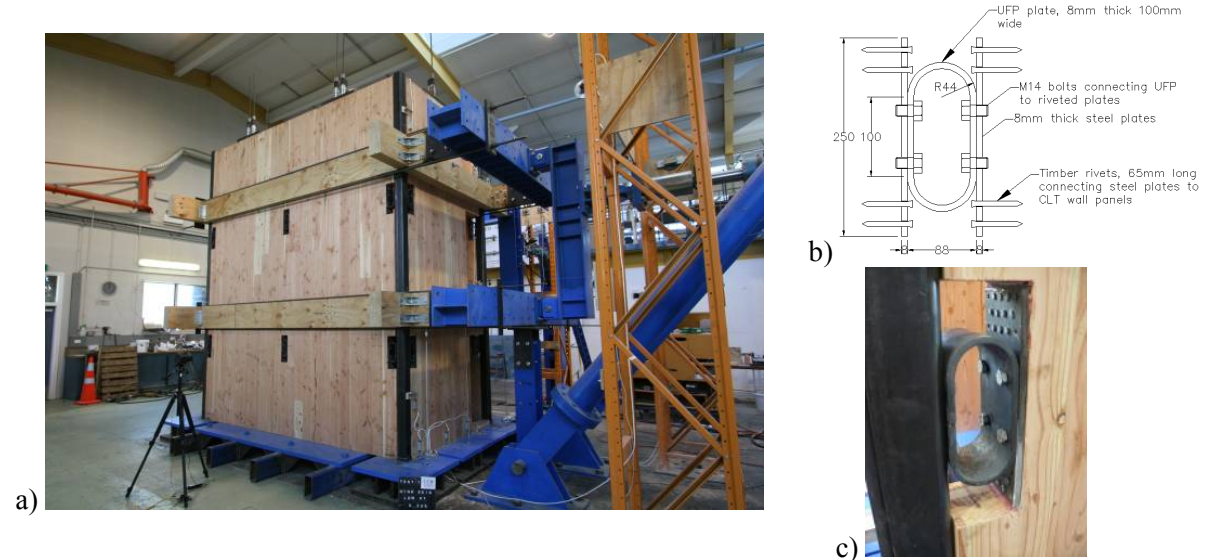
High Seismic option. Post-tensioned CLT walls with UFP devices and steel corner columns, tested at 1/2 scale, a) General test setup, b) UFP connection details between coupled walls, c) UFP-SHS connection.
